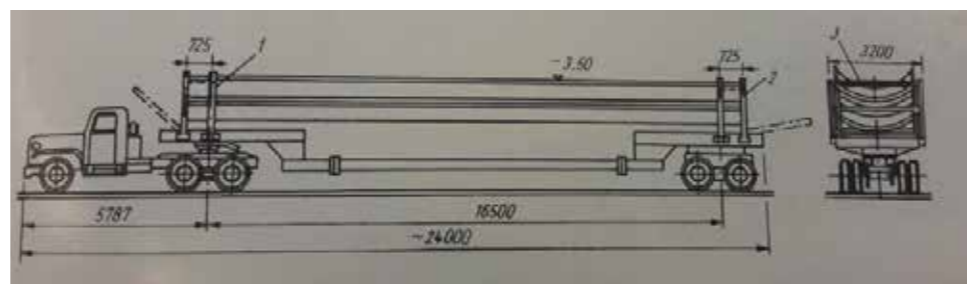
transportation sizes of HP shells Räumliche Dachtragwerke: Konstruktion u. Ausführung, p. 283
